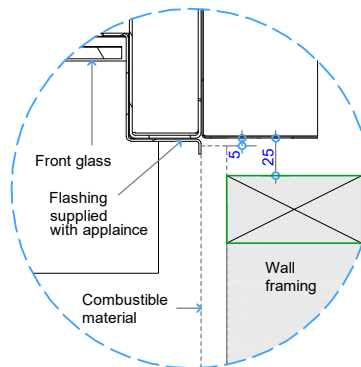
Bottom of Appliance to Floor Opt. 5
